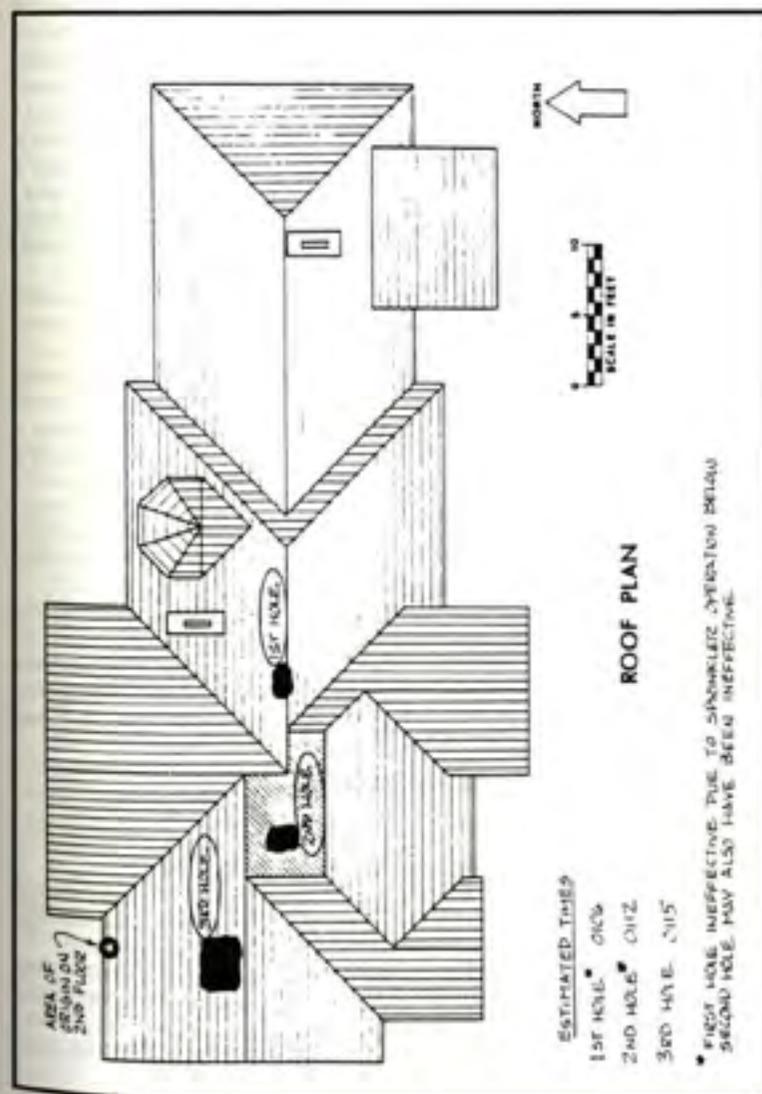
Location of roof cuts – Syracuse balloon-frame fire, New York 1978.
